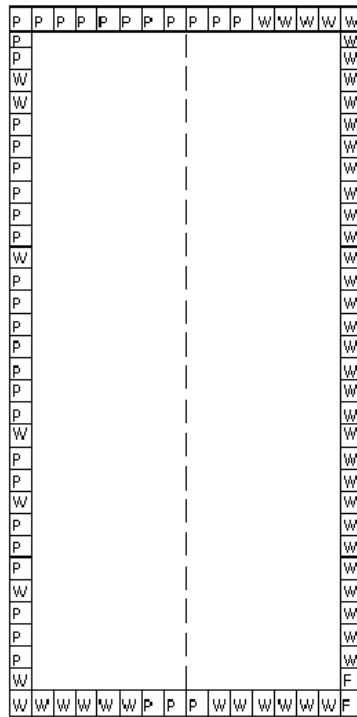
Sheathing nail failure modes for Wall A2.
